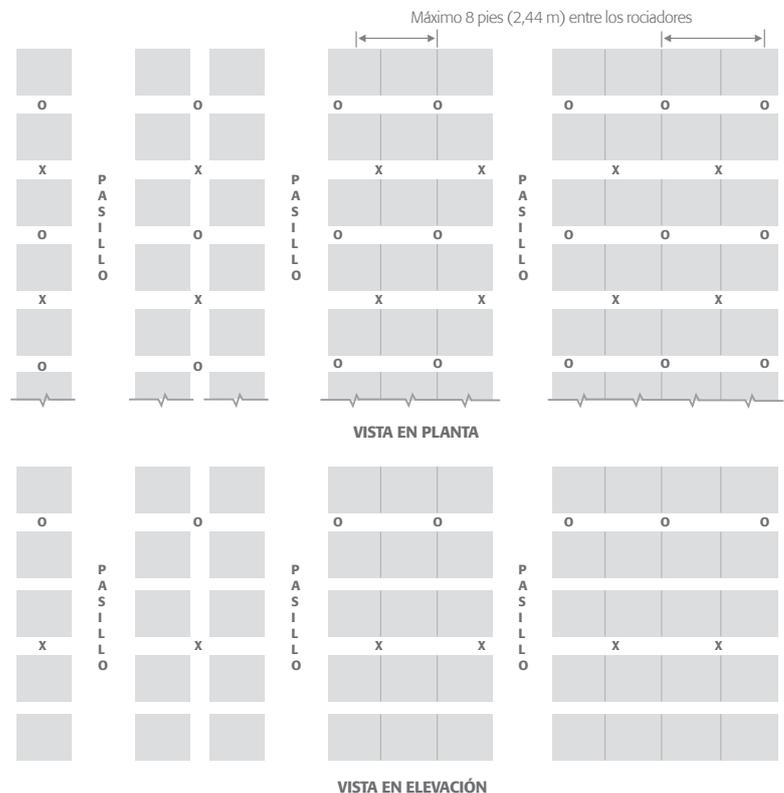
(f) 25 ft (7.6 m) Storage; 5 ft to 10 ft (1.5 m to 3.1 m) Clearance to Ceiling— NFPA 13
